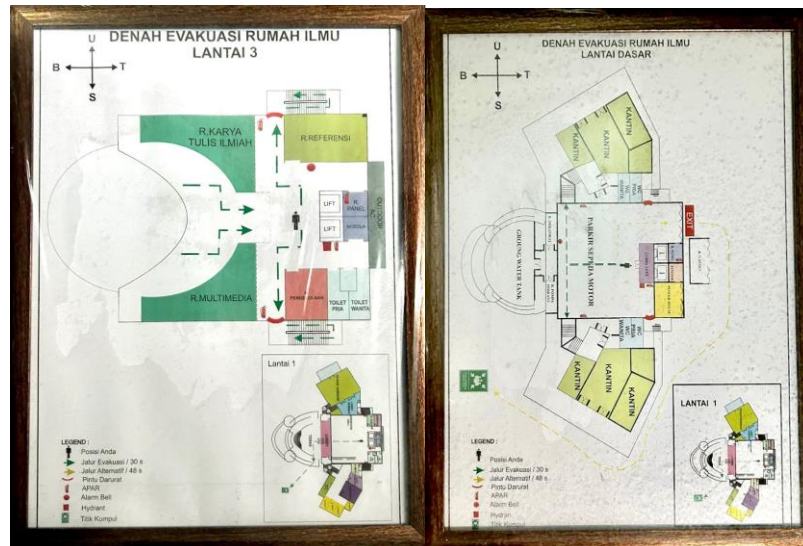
Evacuation route plan at Rumah Ilmu on the first floor and third floor
